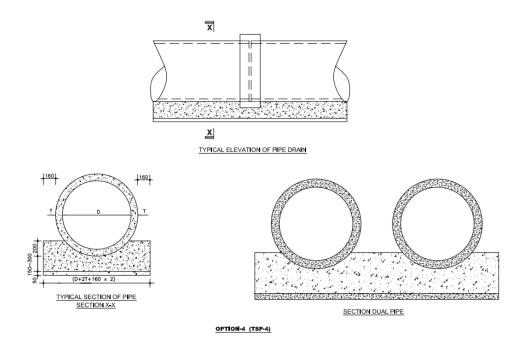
Typical section for Pipe drain/ Hume pipe for Primary or Secondary Drain
